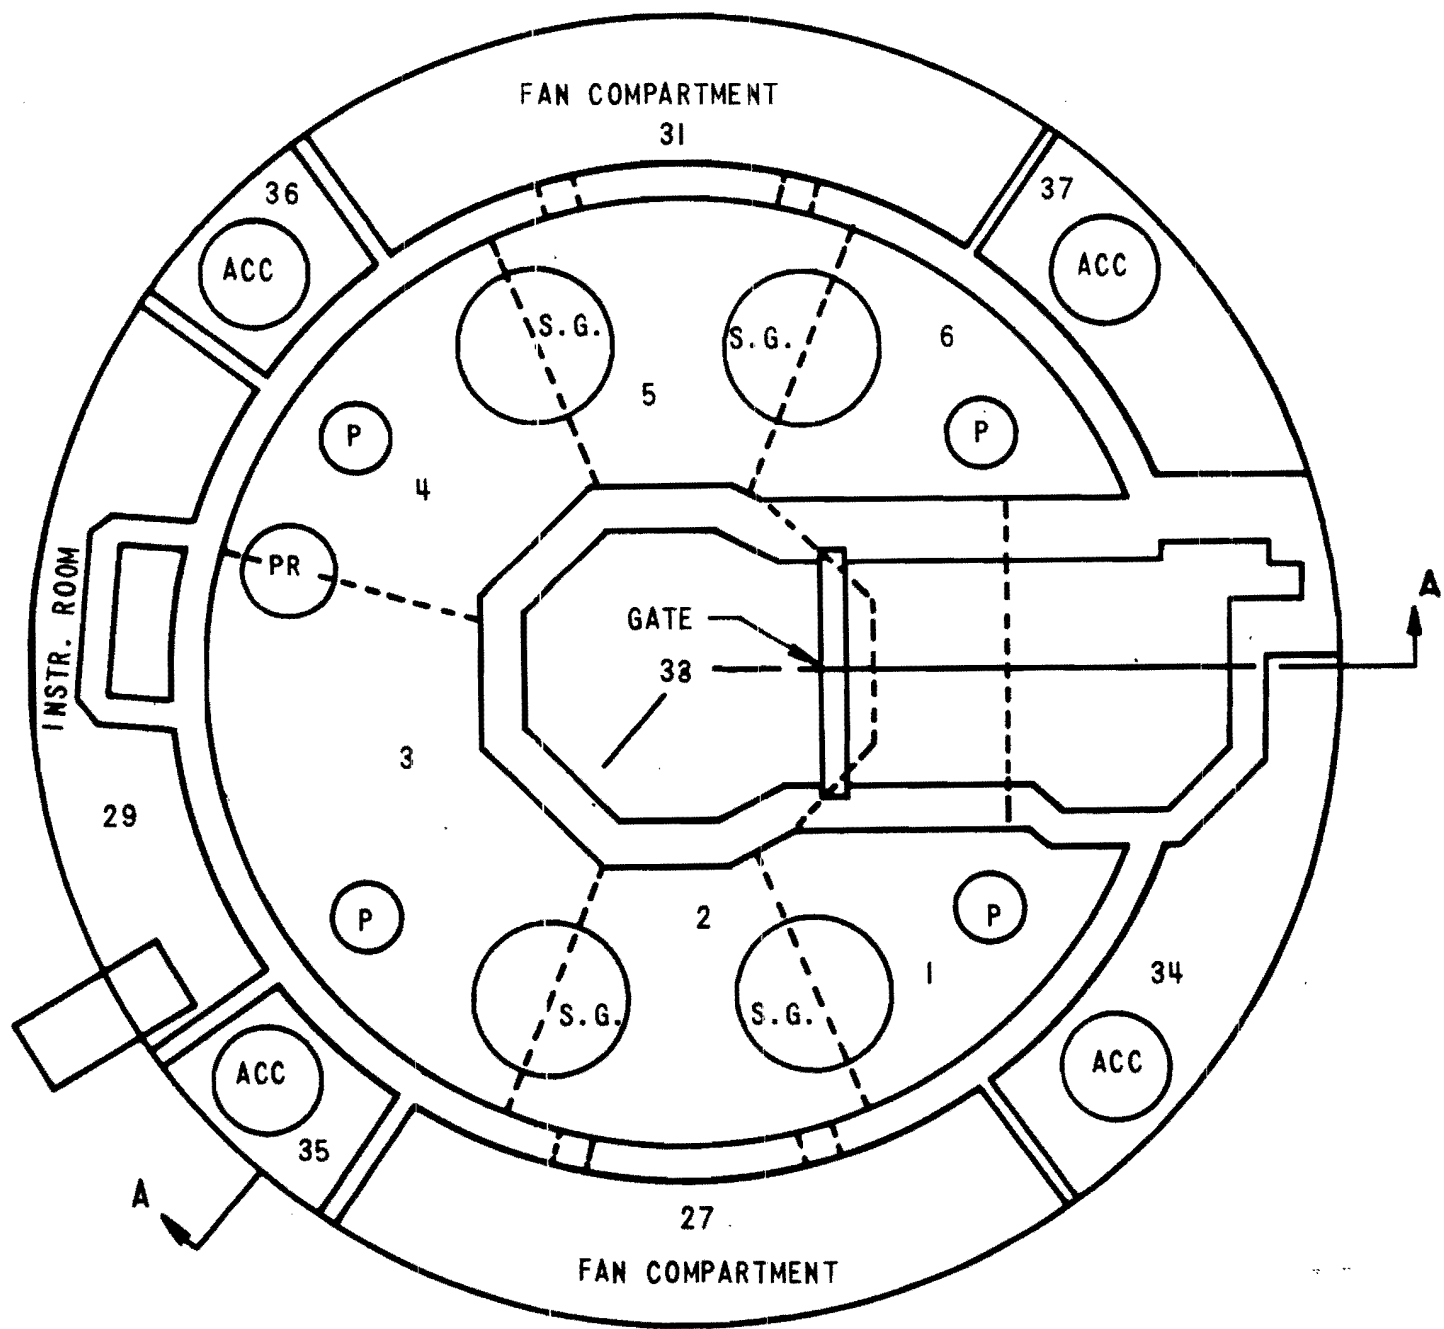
Plan at Equipment Rooms Elevation
